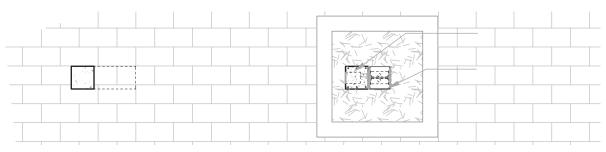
Bollard without light Plan. Scale 1:25 (Author, 2008)
